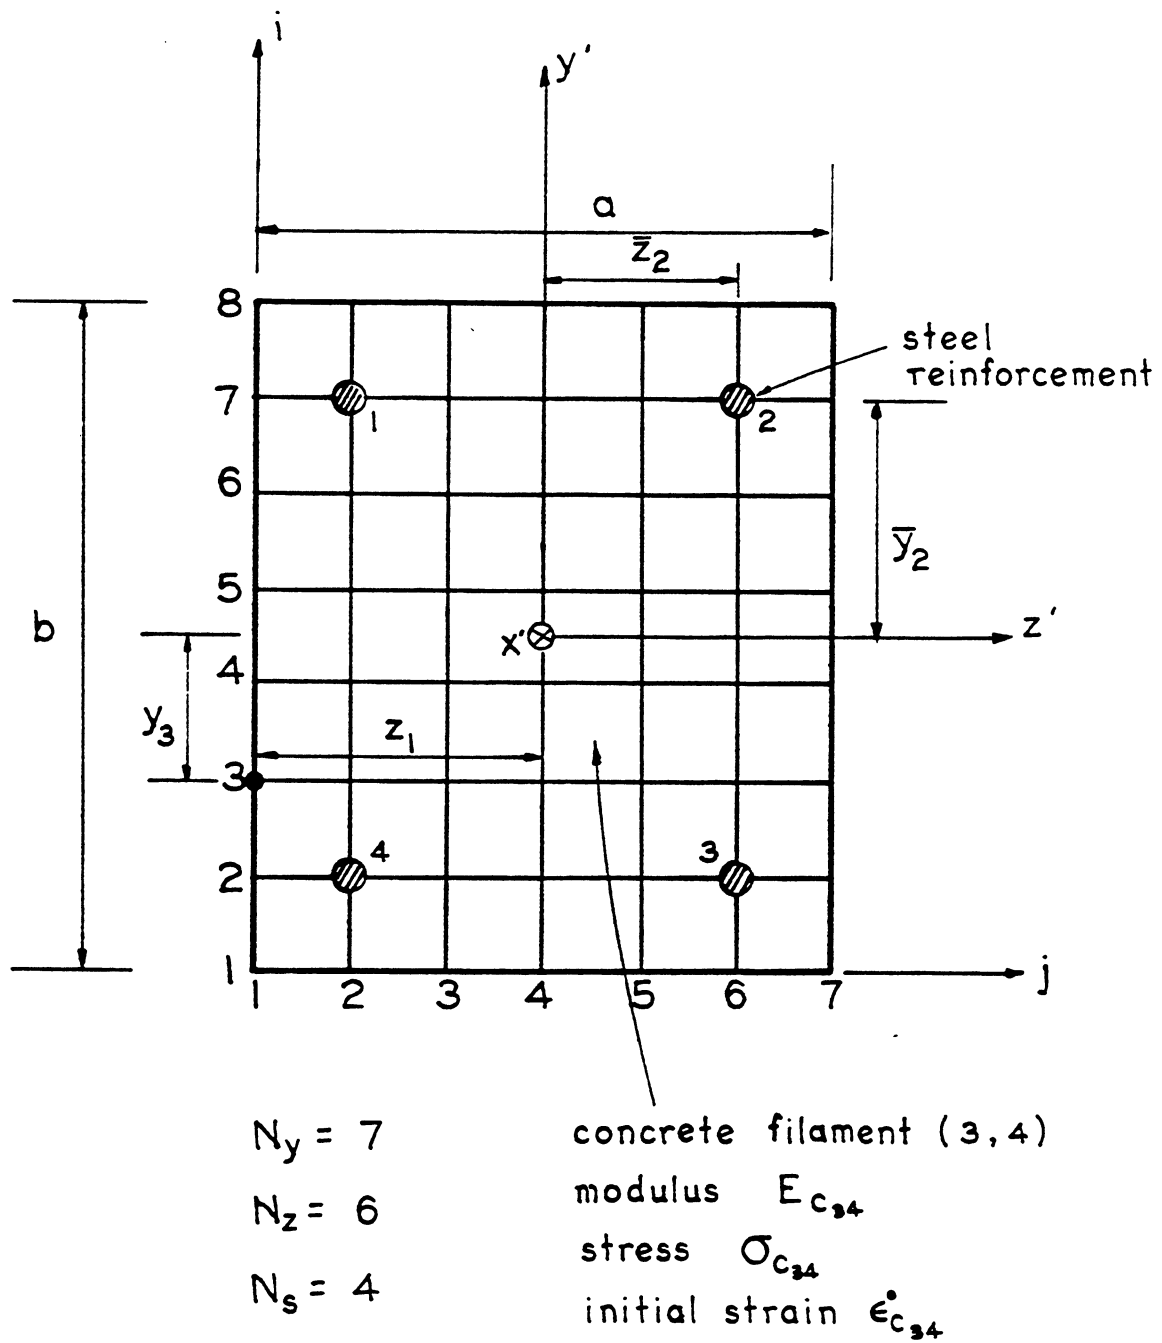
TYPICAL CROSS SECTION OF A REINFORCED CONCRETE BEAM ELEMENT
